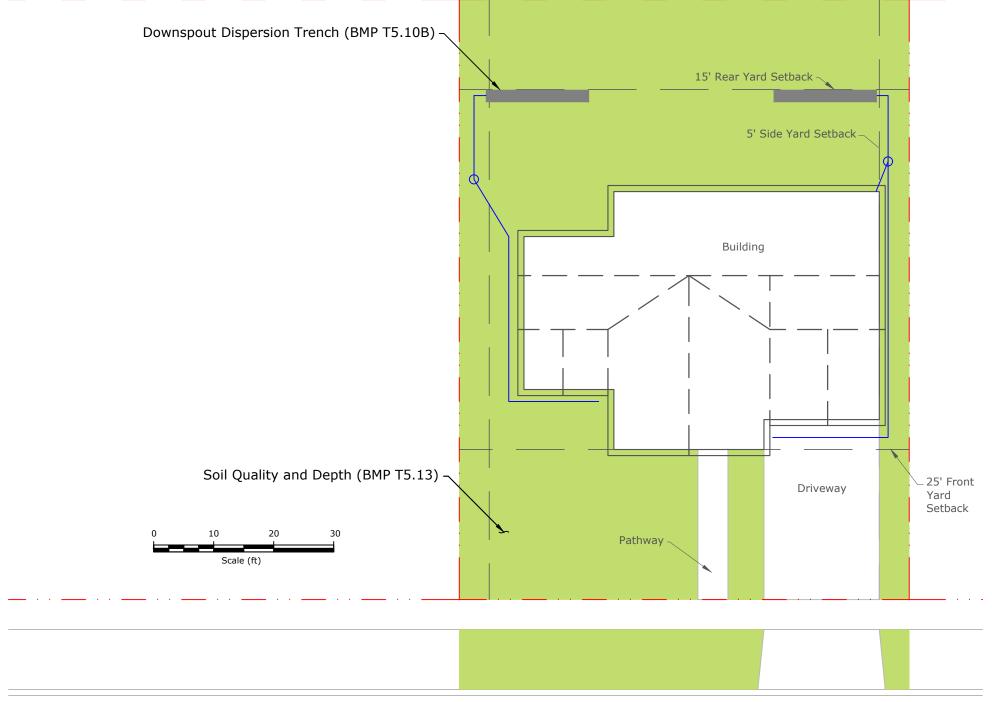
Scenario 2. Permanent Stormwater Site Plan - Single-Family Residential Parcel, 2005 Requirements, Till Soils
